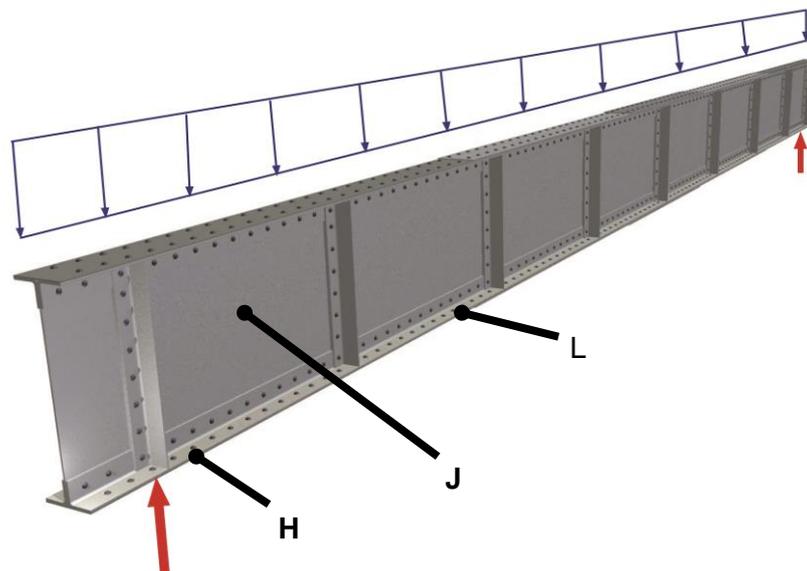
Welded and riveted metallic beam element with indication of possible areas for upgrading. H – joints including rivets; J – shear bearing or buckling; L – load-bearing capacity.
